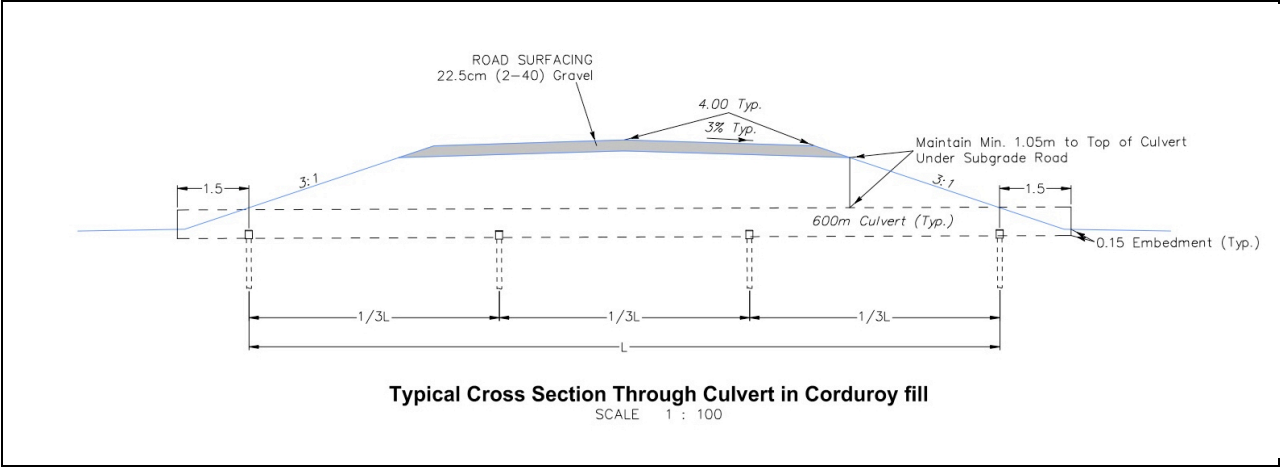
Design drawing of pile placement under culverts. Eliminating the two outside piles may allow culverts to settle more evenly and reduce bowing (Drawing produced by All-Can Engineering & Surveys (1976) Ltd.).
